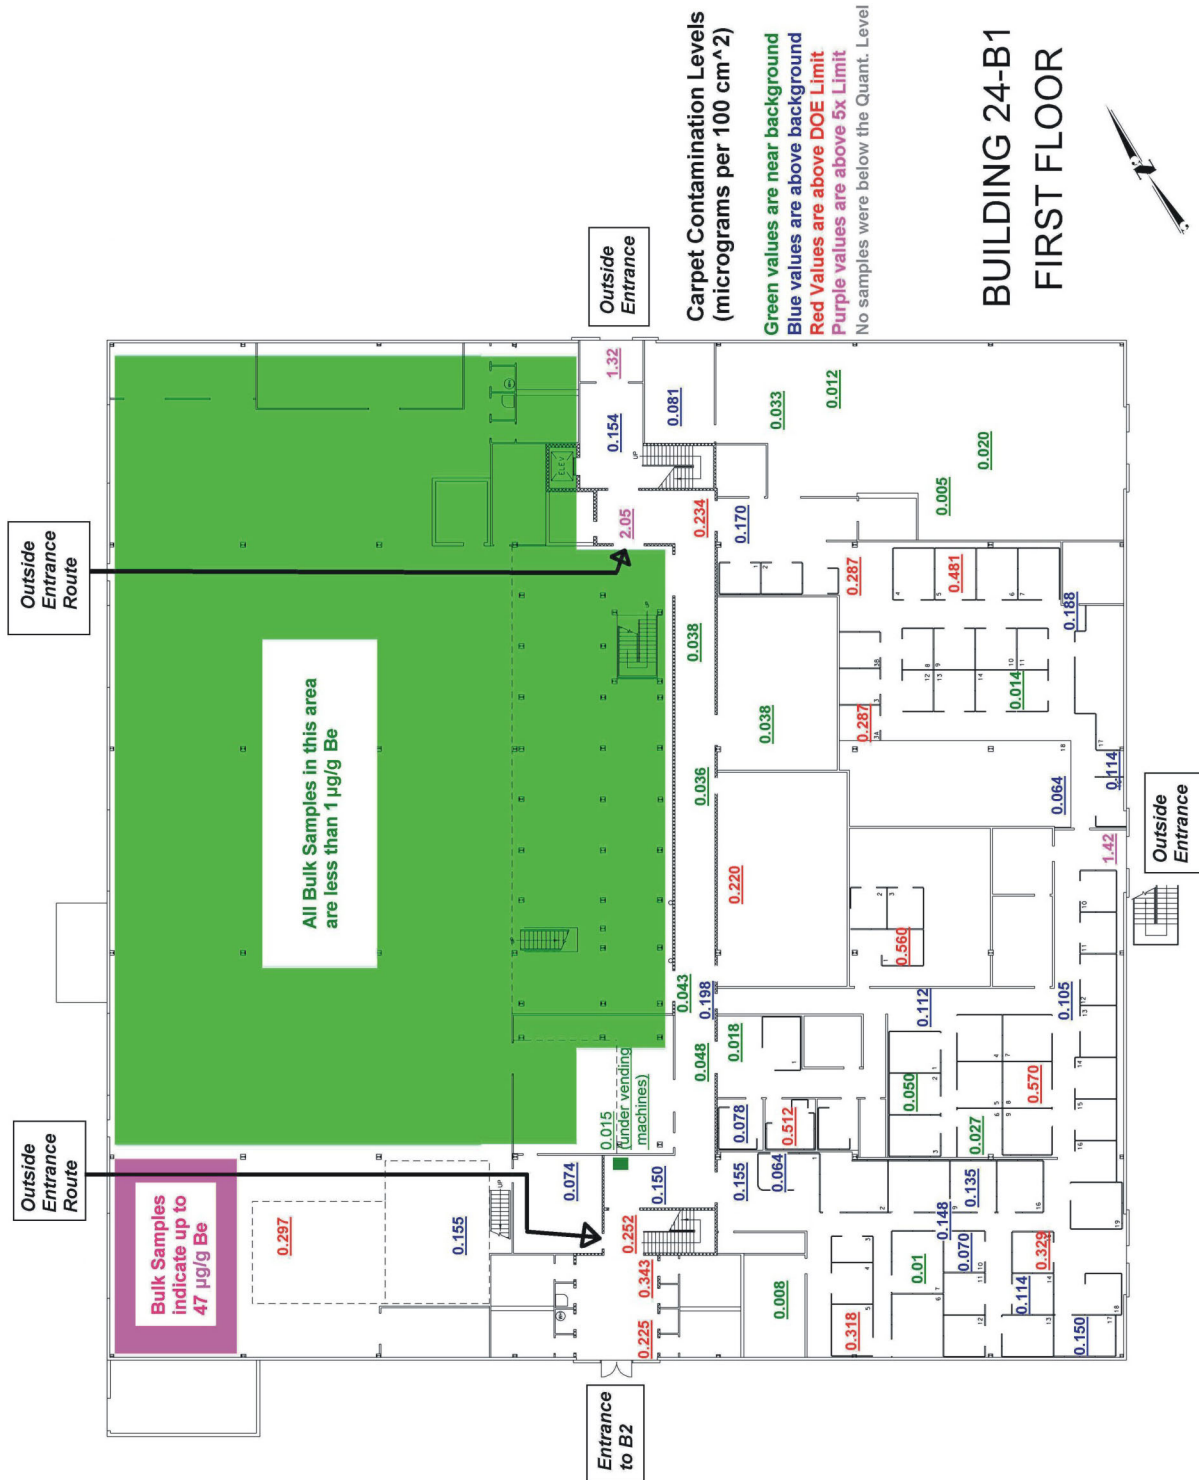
Beryllium contamination in the first floor of B1.
